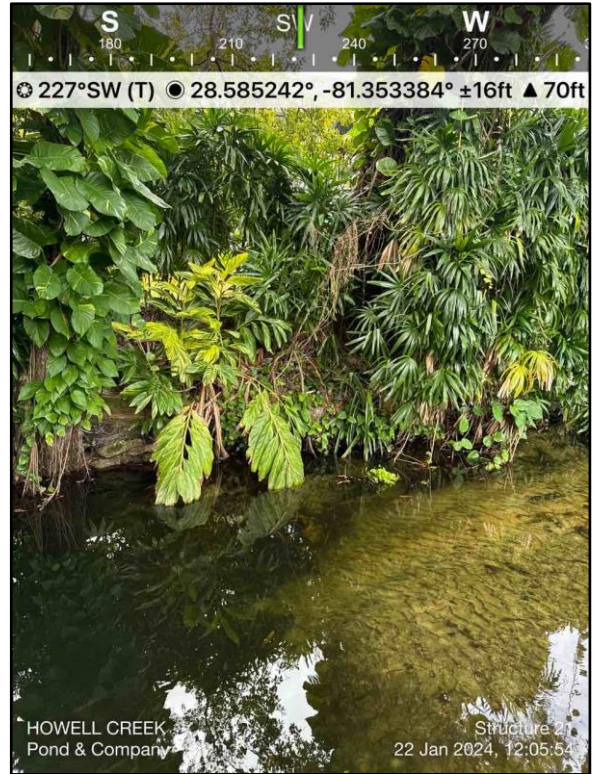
Structure 20; Wooden Cross Tie Retaining Wall (Priority 0)
